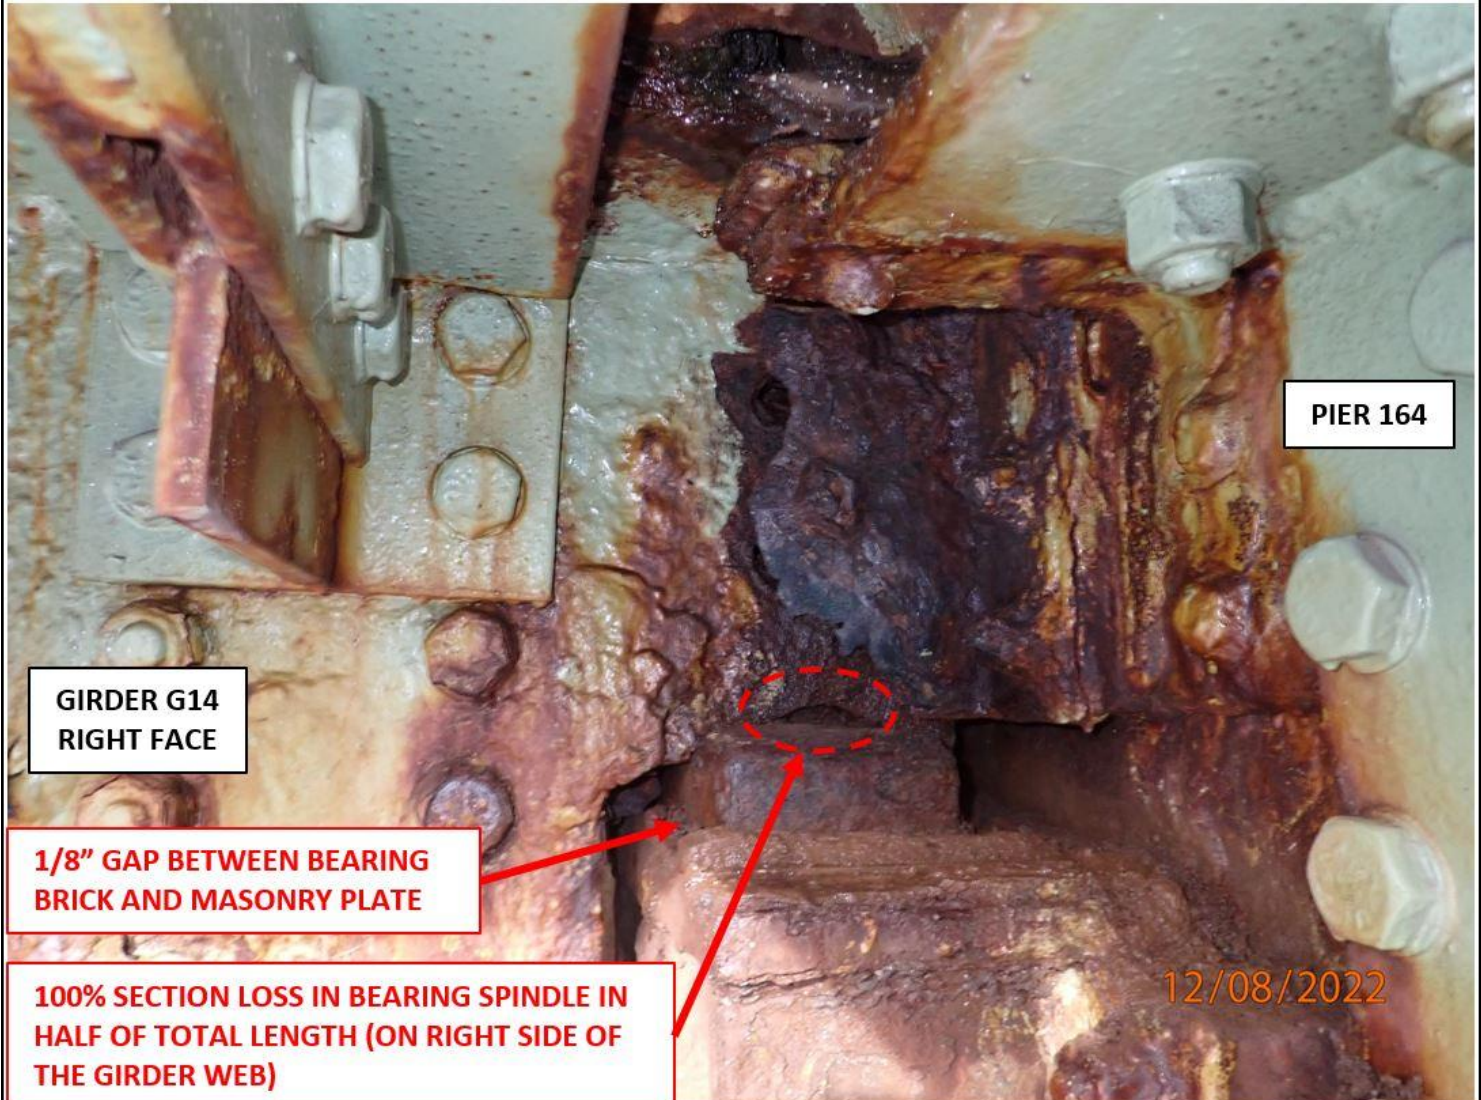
Photo Filename: G14 RF @ P164\_LOOKING LEFT.JPG
